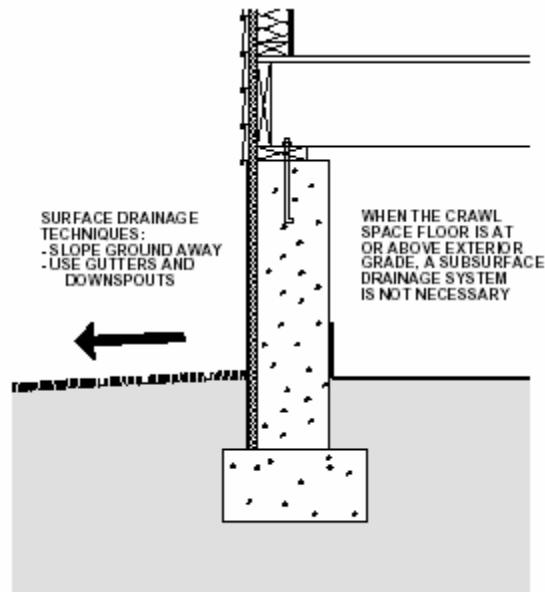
Crawl Space Drainage Techniques (surface drainage)
